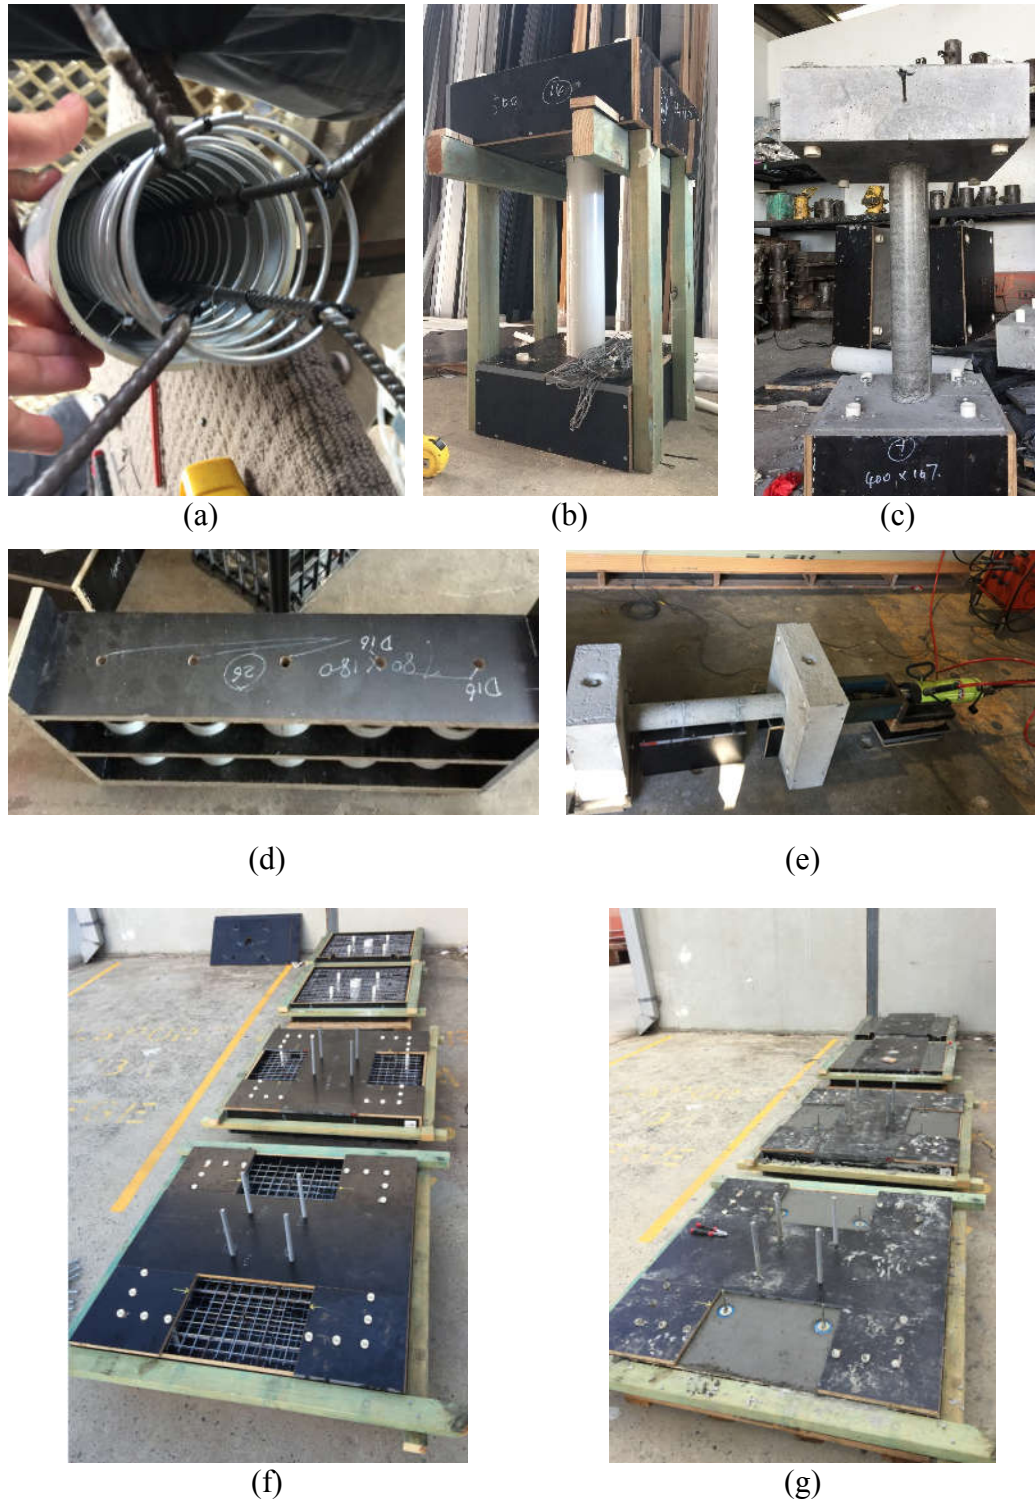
Construction of the specimens: (a) arrangement of rebars for the monolithic column, (b) formwork for the monolithic column, (c) monolithic column after curing, (d) formwork for the segmental column, (e) posttensioning setup of the segmental column, (f) base slabs and top mass slabs before casting, (g) base slabs and top mass slabs after casting
